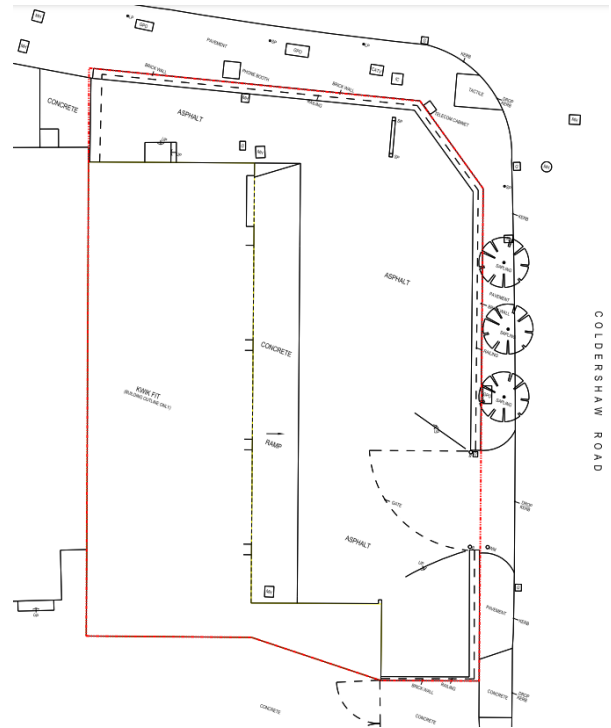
Site Plan (Source: MAA Architects) – 1:100
